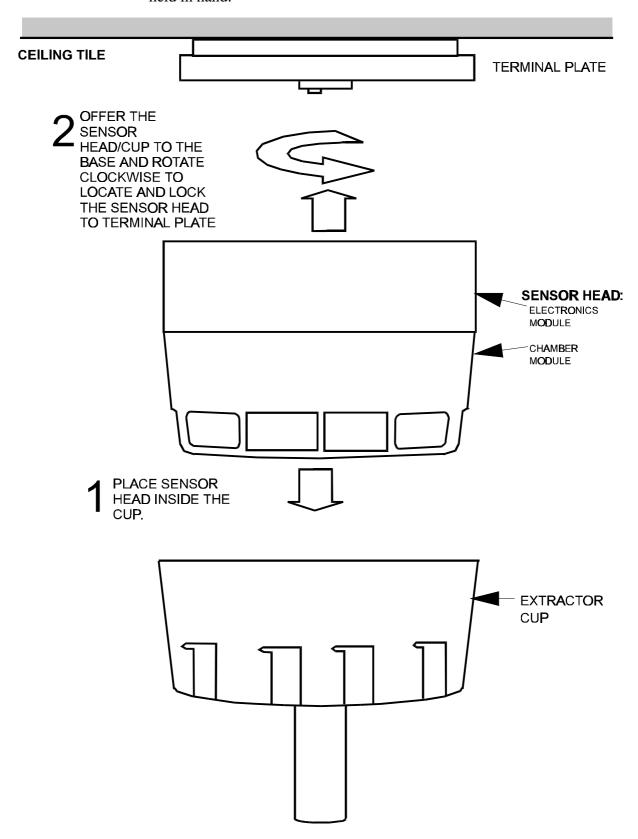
Fitting a sensor head to terminal plate 1124
